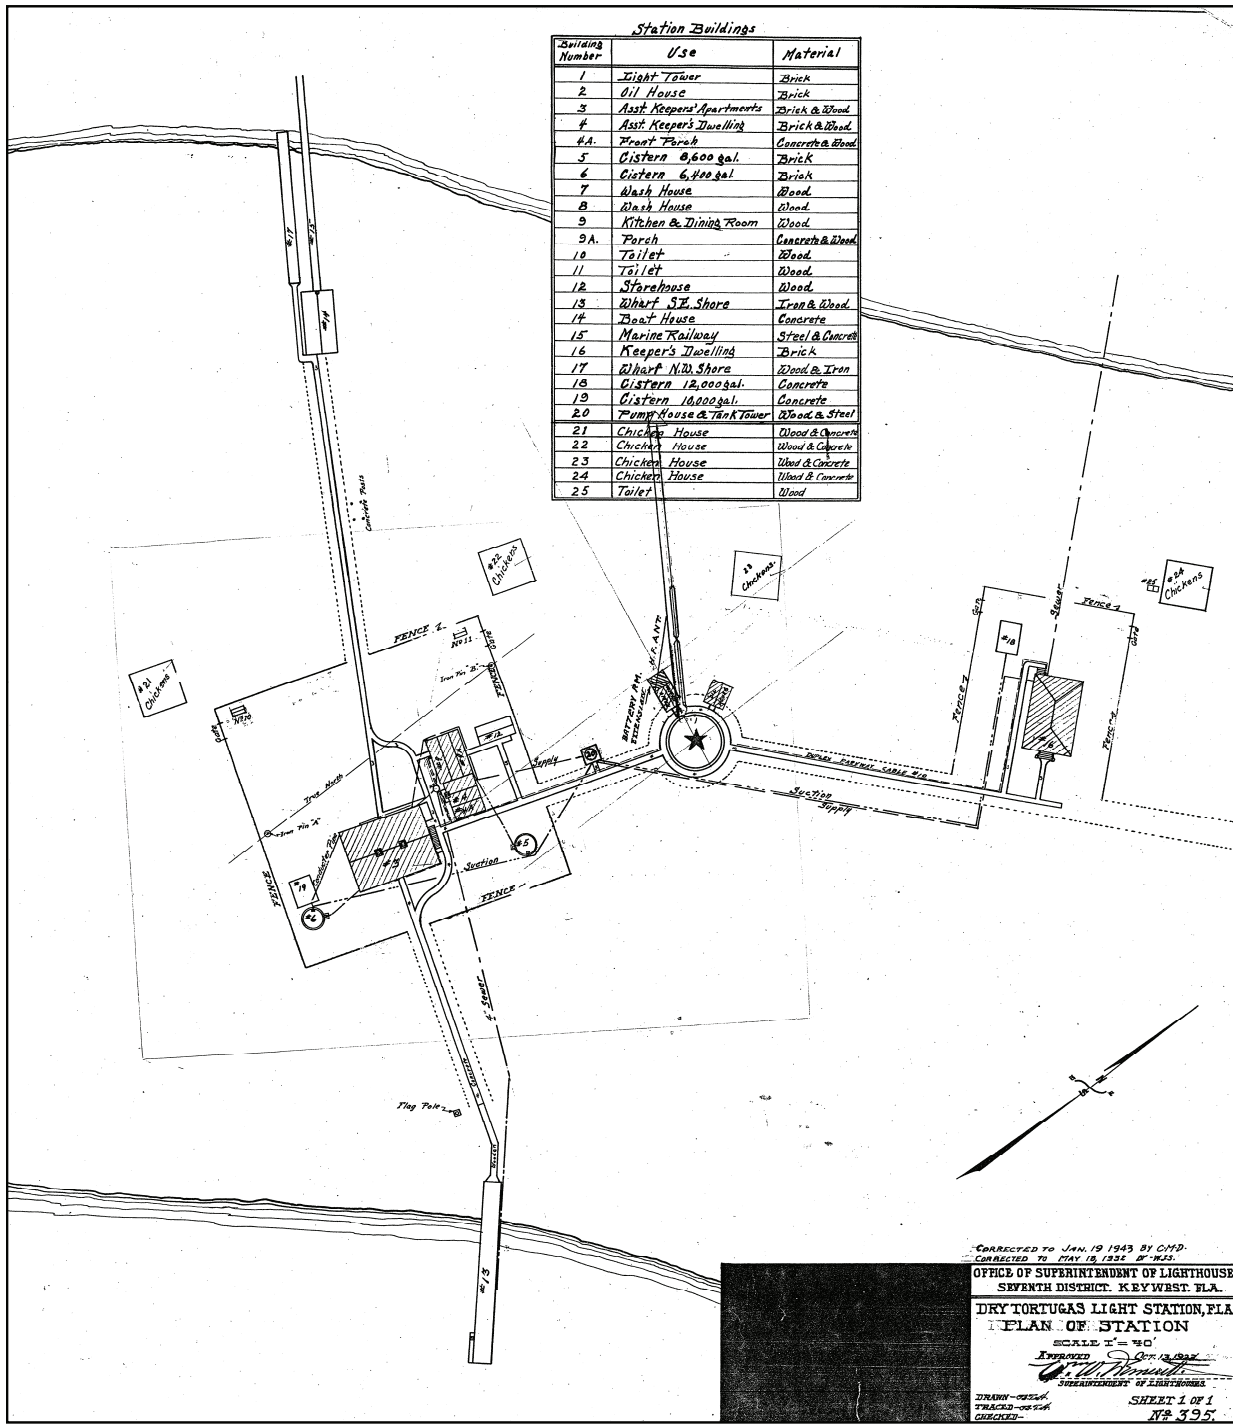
Site plan of Light Station dated 1923 and corrected to 1943 showing inventory of buildings at that time.
